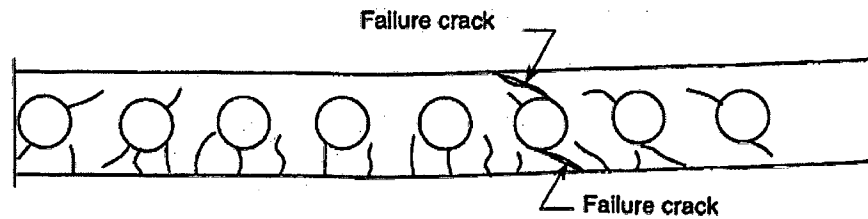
Shear failure of Beam B4 at the throat section (Salam, 1977).
